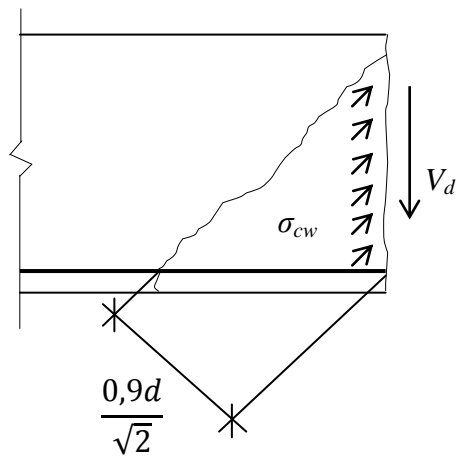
Forces in the inclined concrete strut. Adapted from Engstöm et al. (2008).
